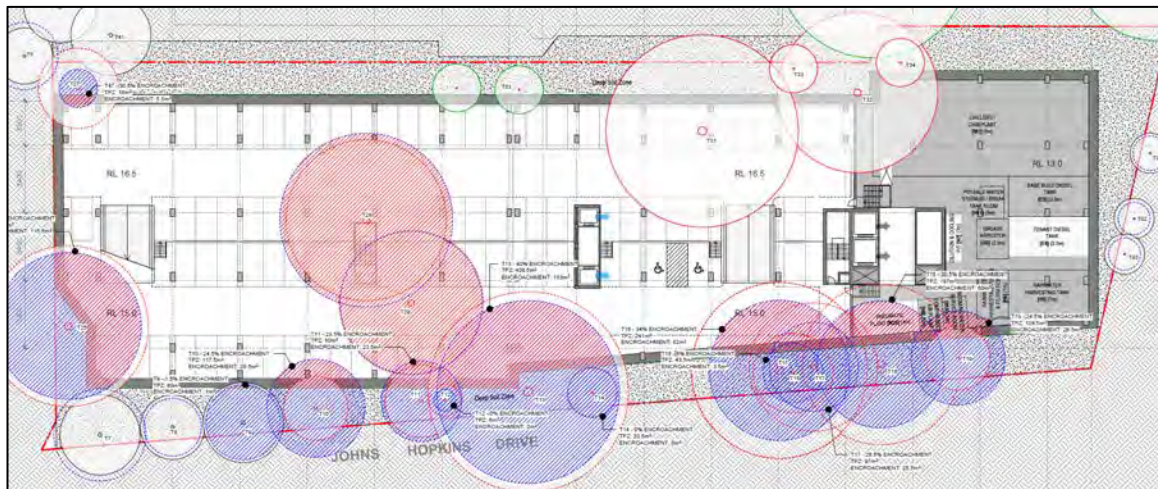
Basement 3 Plan showing tree impacts. (Source: Tree Impact Plans by architectus Rev U, dated 29/05/2025)
